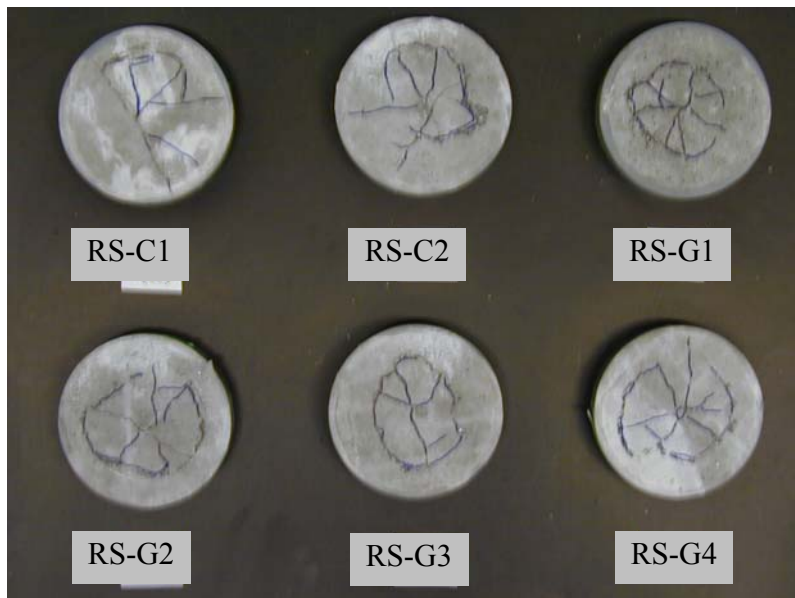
Typical cracking patterns of slabs after punching shear (bottom face)
